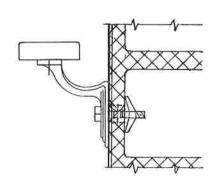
Directly on hollow masonry wall. One 3/8" toggle type anchor.
